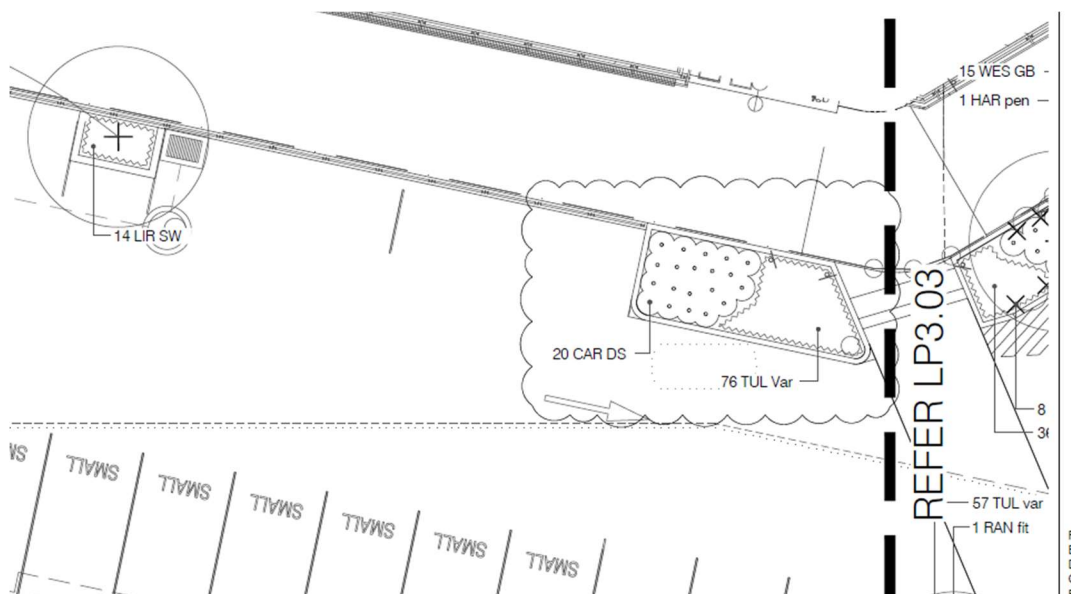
Minor Change Proposed Plan (LP3.02 (Rev F))
